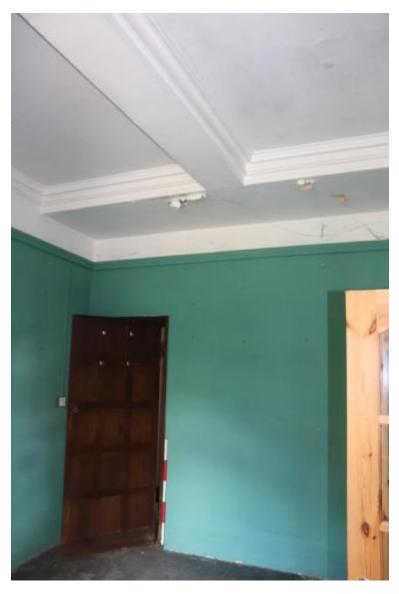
Room G5a, with mouldings on the ceiling potentially concealing Phase 1 beams, looking north, scale 1m
